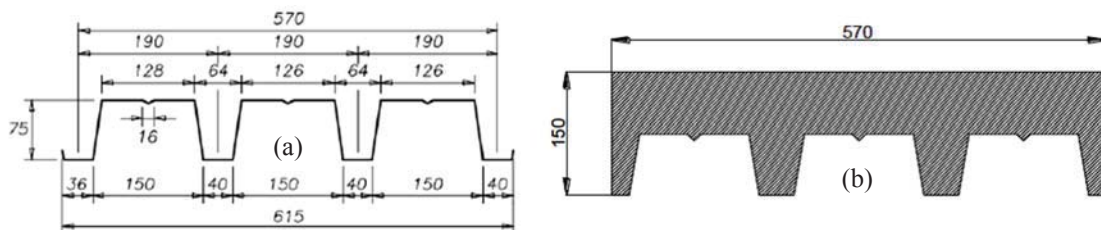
Cross-section of the deck: (a) corrugated sheet A75/P 570; (b) central span, with cast-in-situ concrete.
